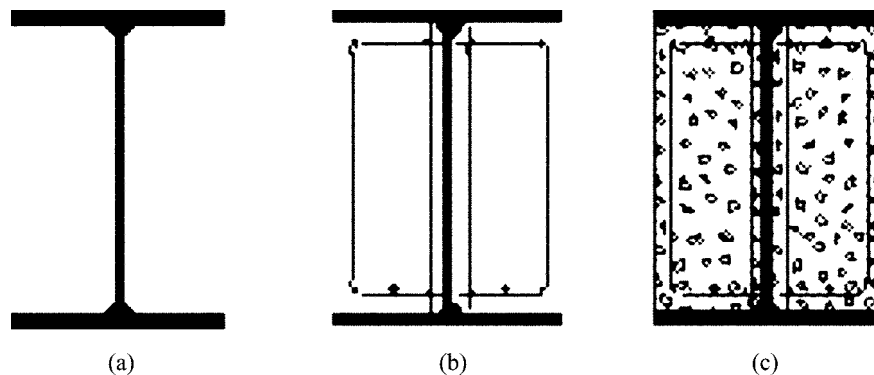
(a) Welded I-shape; (b) Welded I-shape with bars and stirrups; (c) Welded I-shape filed with reinforced concrete
